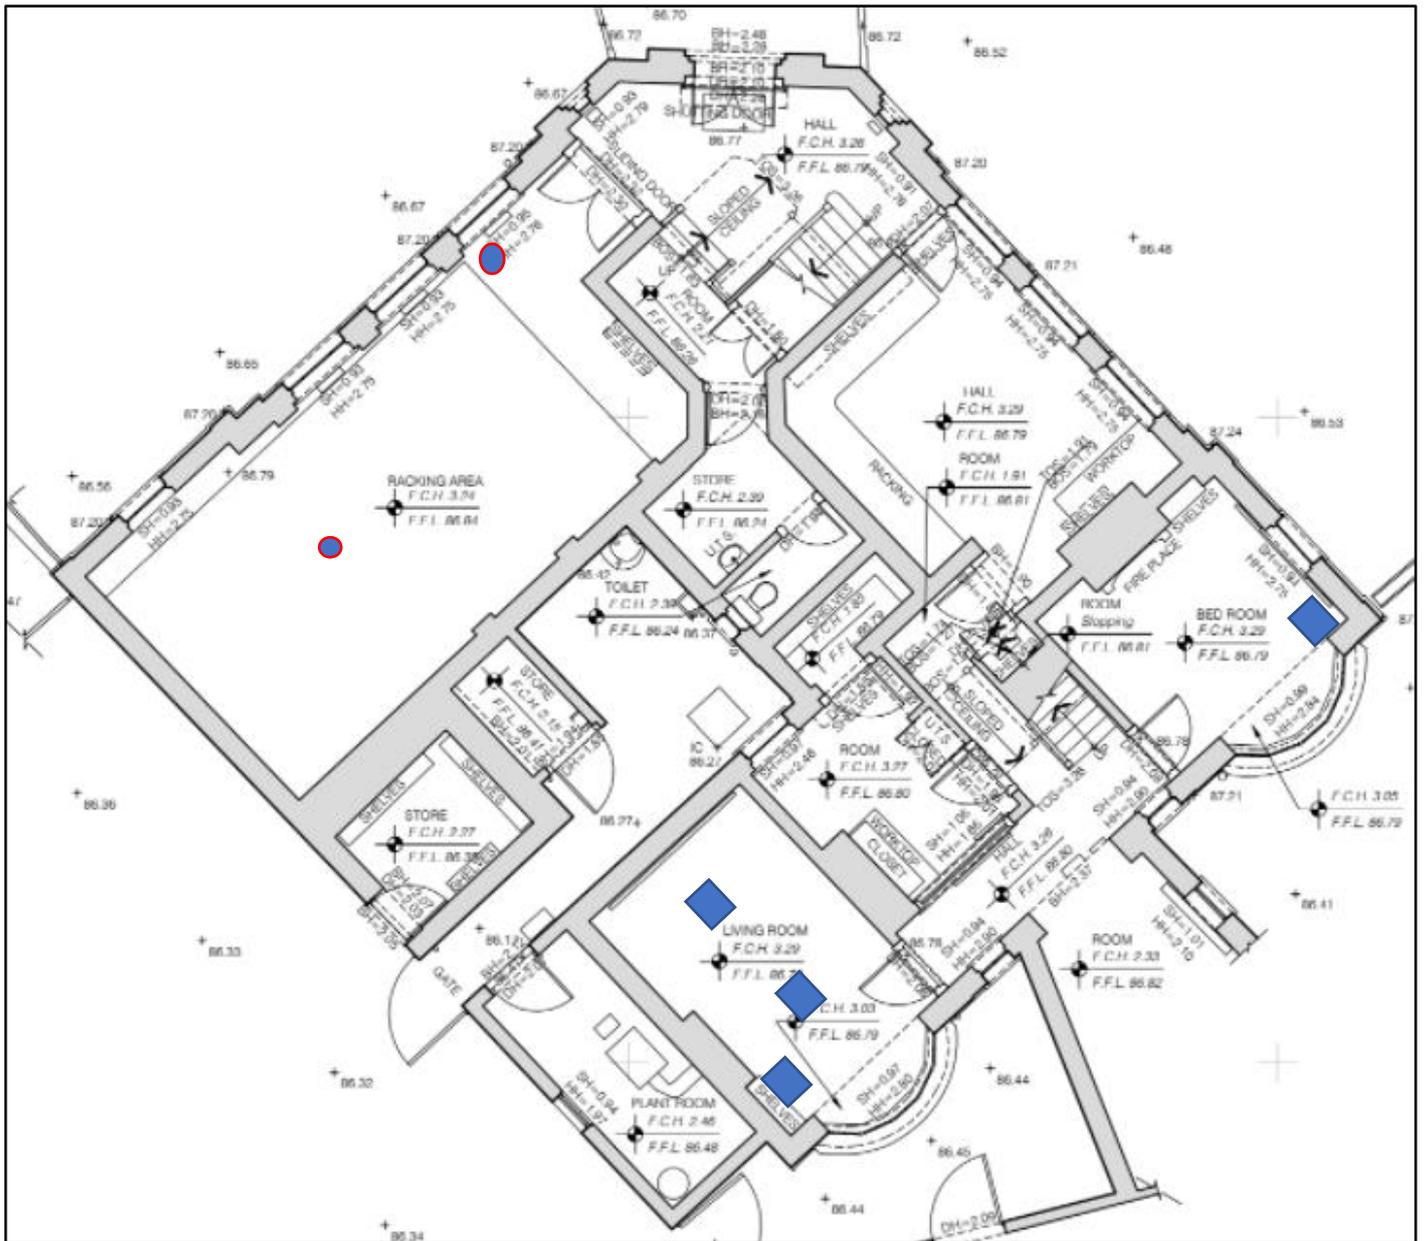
Showing the ground floor plan. We have marked up the areas opened up by PJ Barrett in a Blue Square and circle, where we drilled the floor in the Book Repository room.
